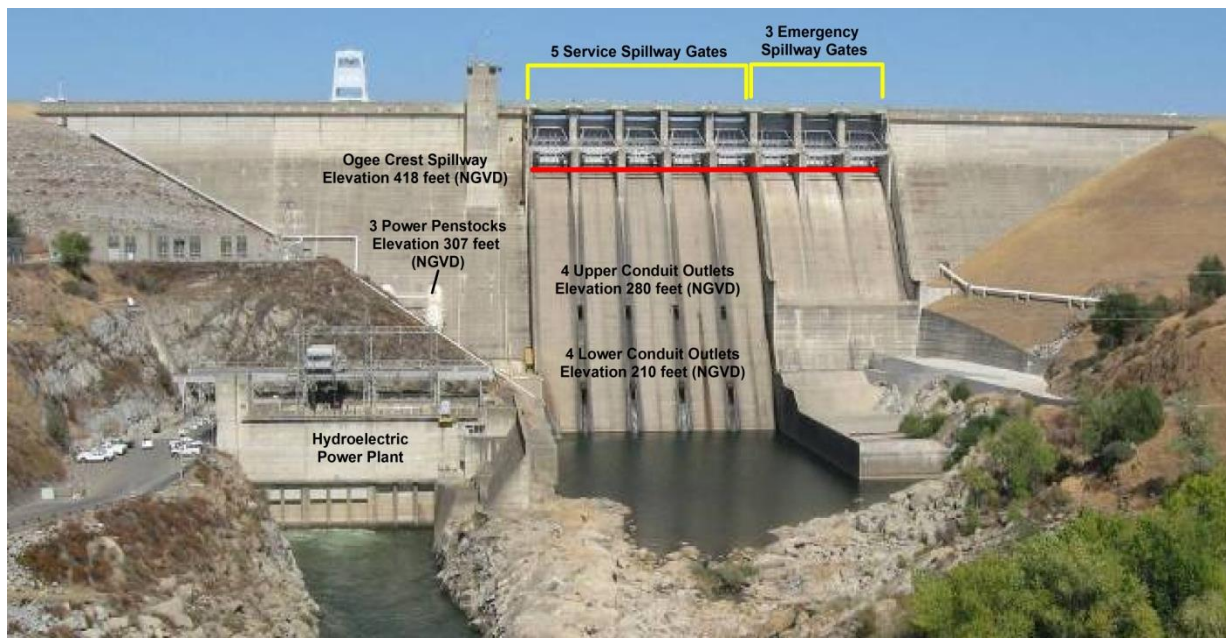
Concrete Gravity Section of Folsom Dam.
